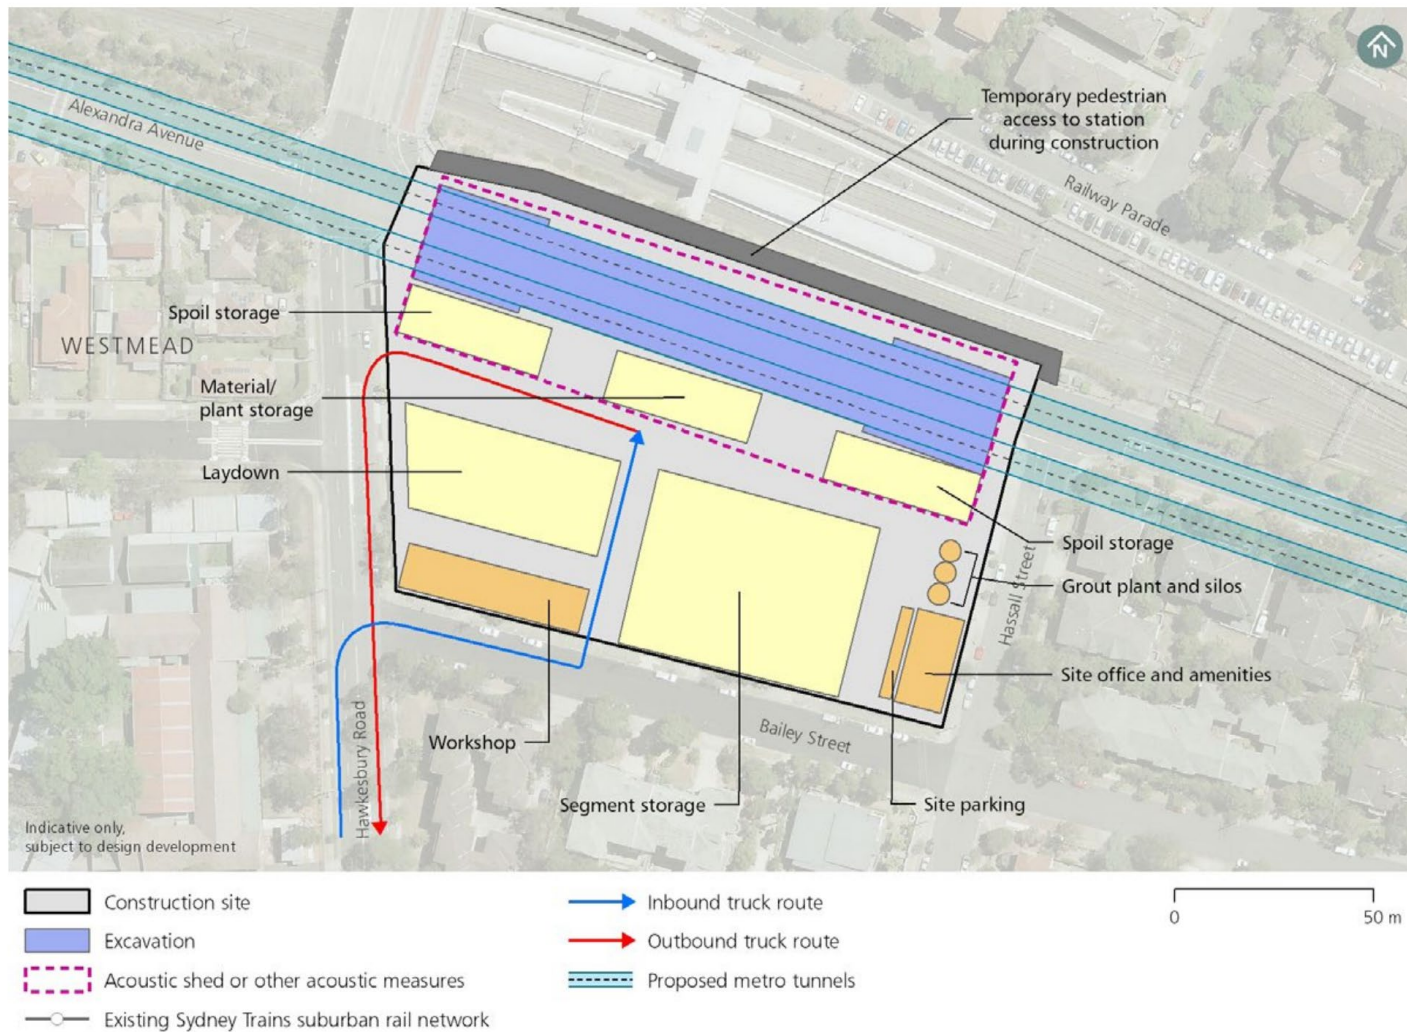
Westmead Metro Station indicative construction site layout (Source, EIS Figure 9-12)
